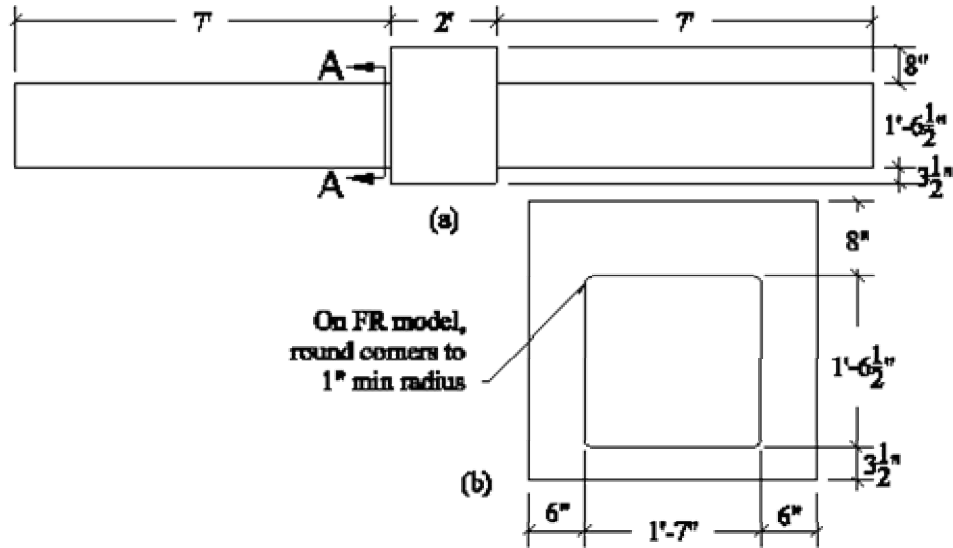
FR and FC specimen geometry: (a) side elevation; (b) end elevation.
